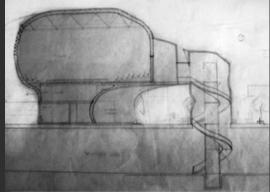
conceptual section exploring vertical movement from basement to ground floor and front of house.
